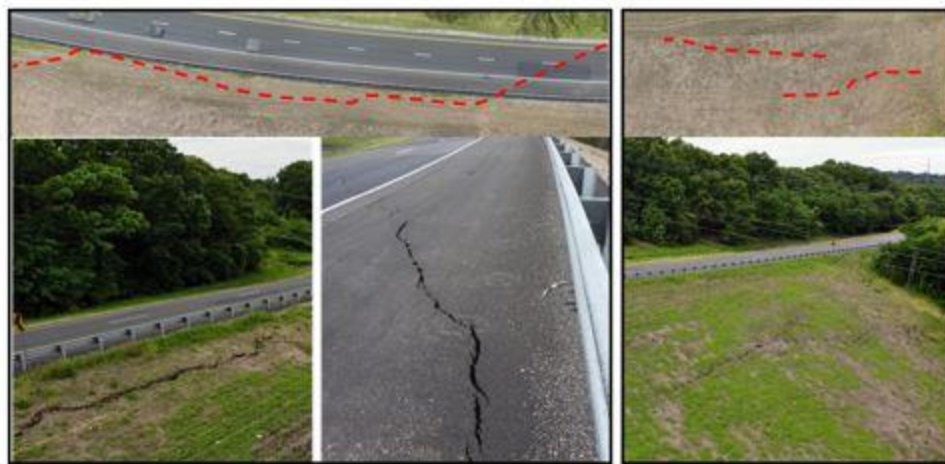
Longitudinal Pavement Cracking and Soil Cracking (Used with Permission from Salman Rahimi)
